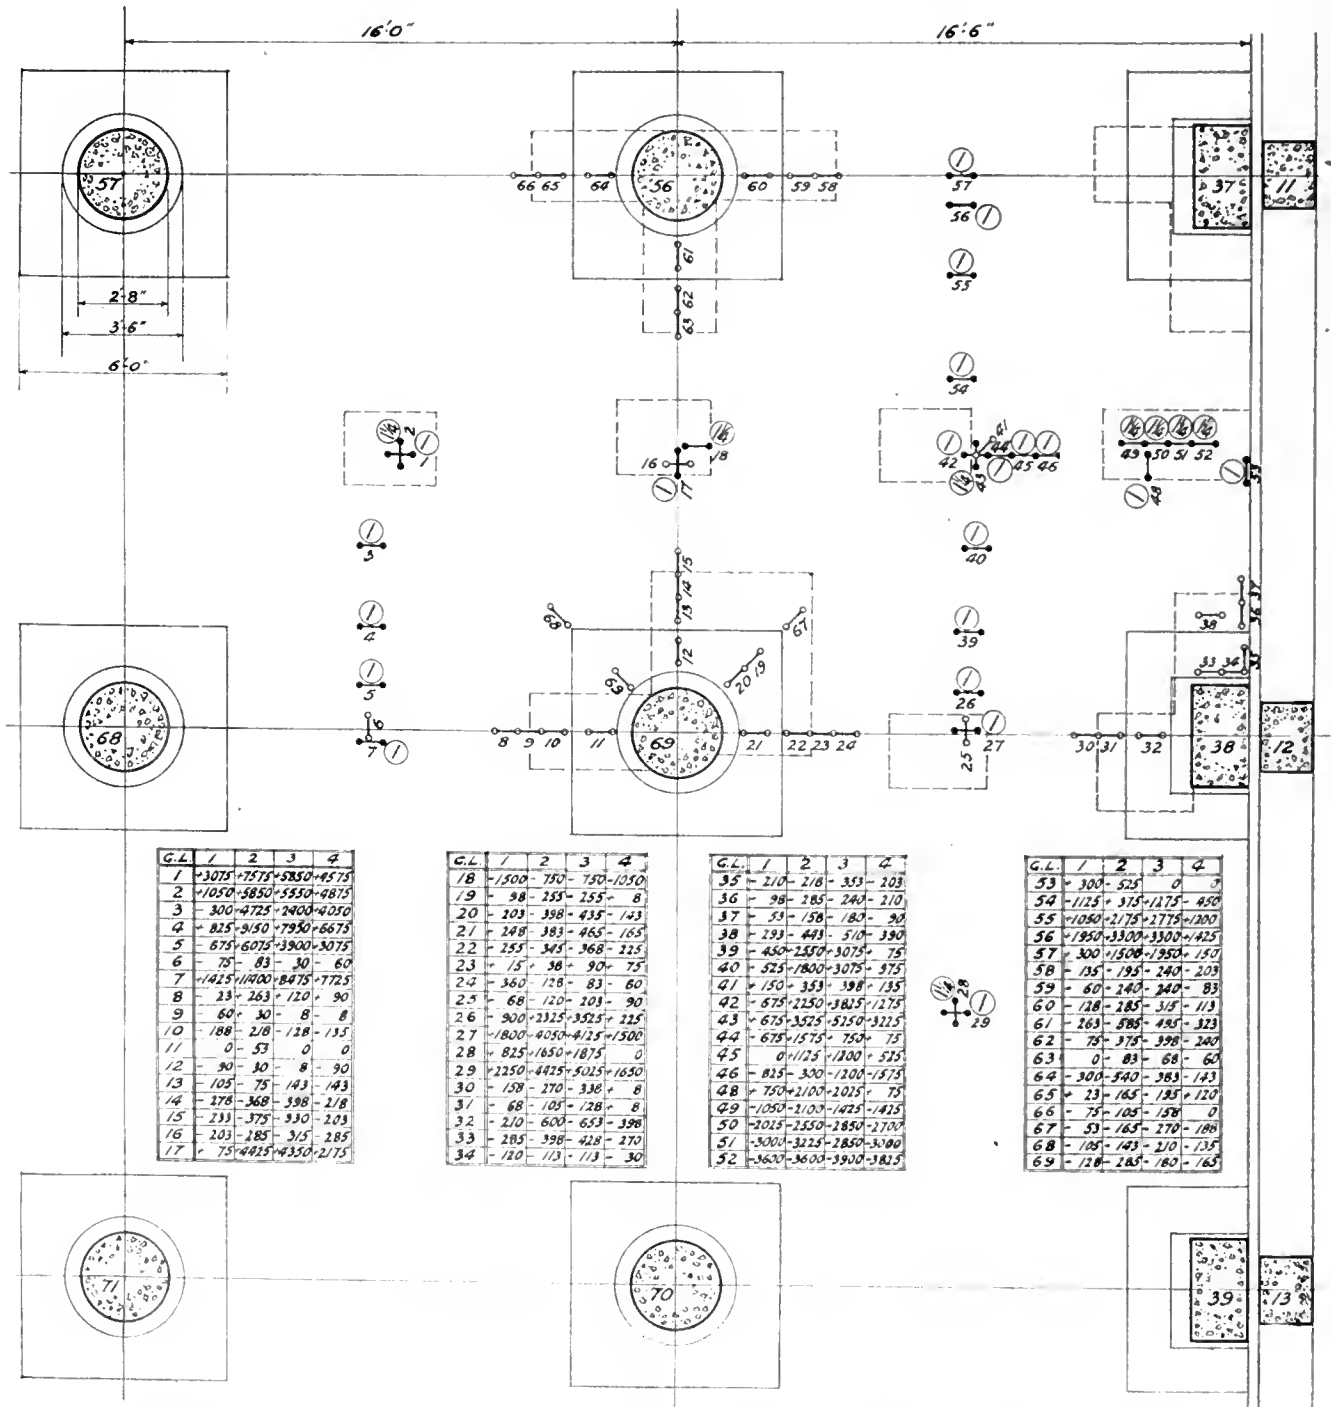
Plan of test portion of basement ceiling, showing location of extensometer measurements. The tables give the stresses.
